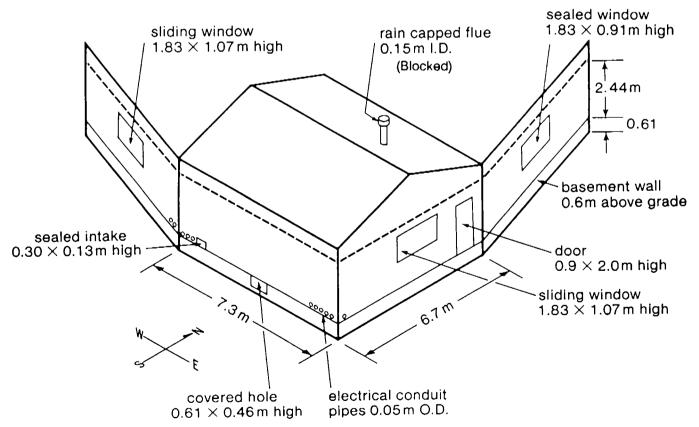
Isometric View of Test House Showing Building Dimensions and Leakage Sites
